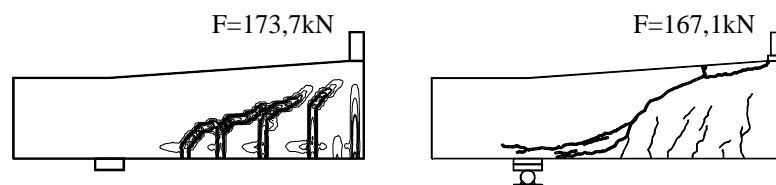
Crack propagation at failure of test beam 2K1 from Non-FEM and test
